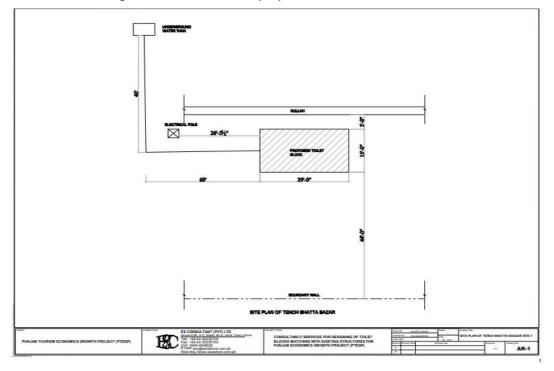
Location of the proposed toilet block at Tench Bhatta Bazar Site I
